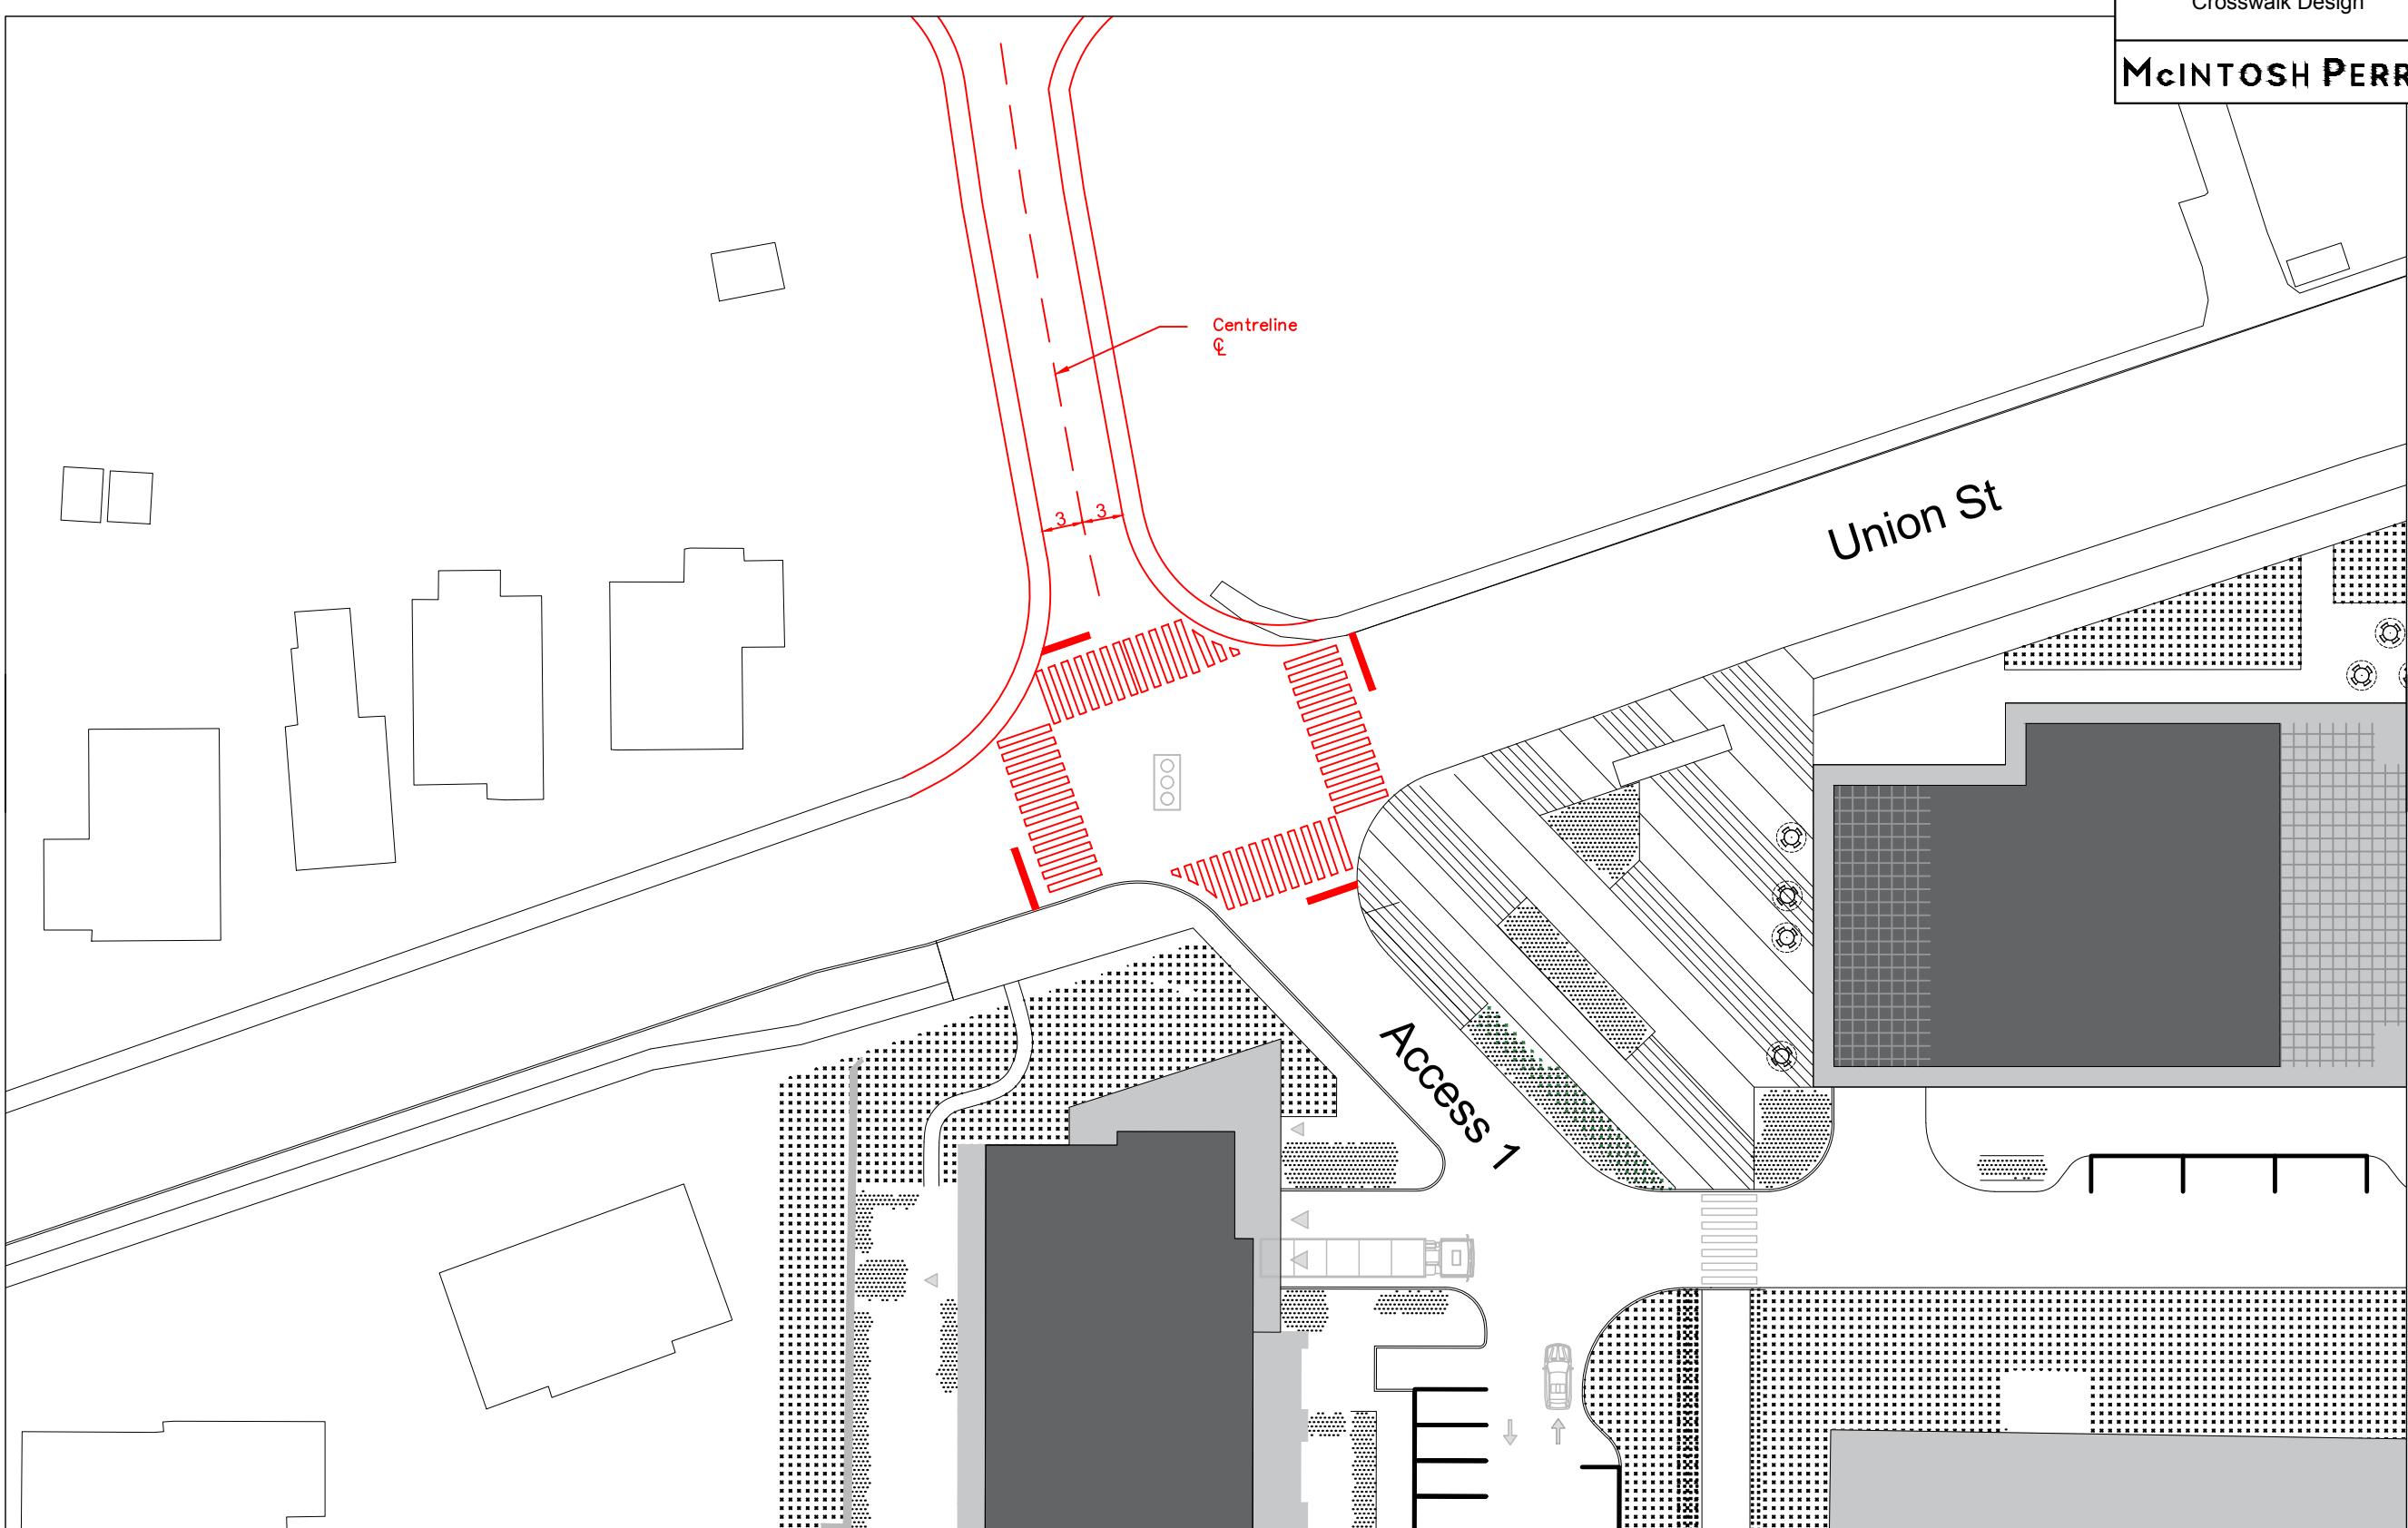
SITE AND ON-STREET PEDESTRIAN CONNECTIVITY
